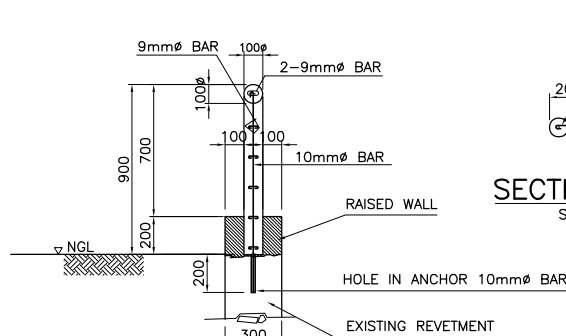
DETAIL OF PRECAST CONCRETE HANDRAILS TYPE-3 (INSTALLED IN INCLINED WALL)
